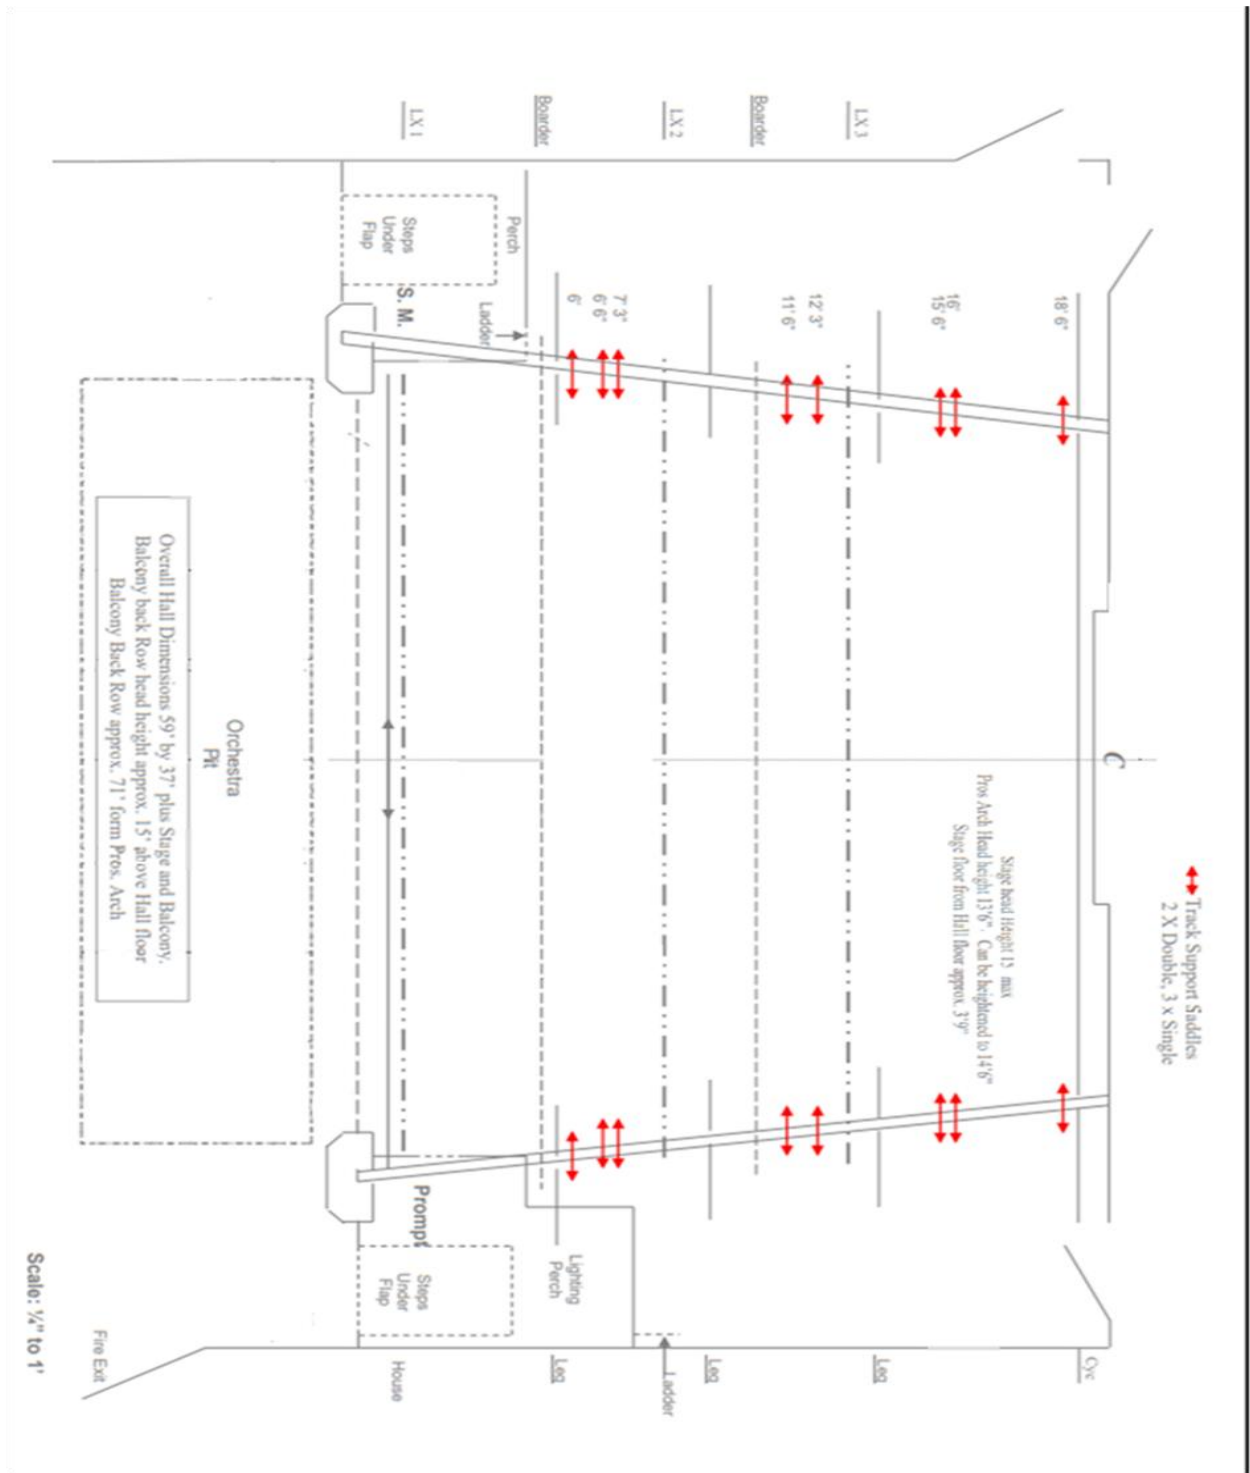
Witham Public Hall Stage Plan (scale 1/2" to 1'0").
